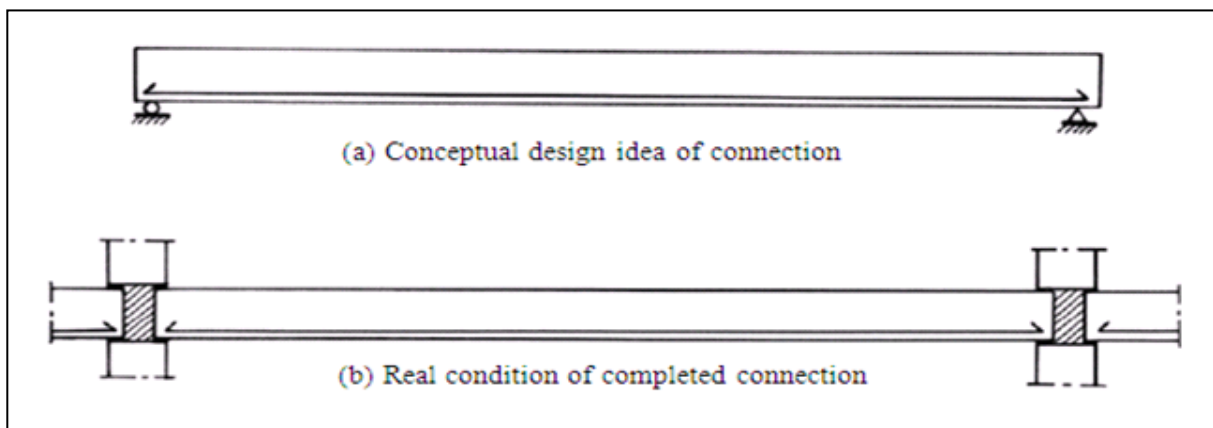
Illustration of unintended restraint for connection detail (FIB - Féd. Int. du Béton 2002)
